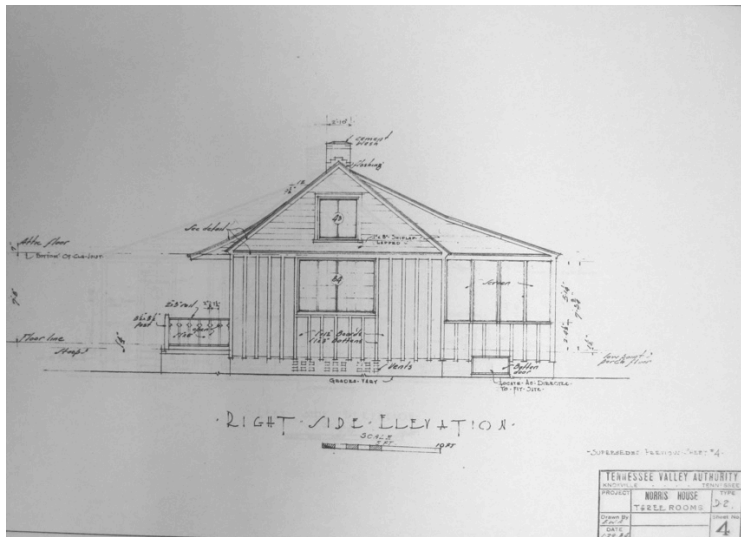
Construction Drawing for Norris House D-1 (TVA Archive, National Archives Building, Atlanta, GA)
